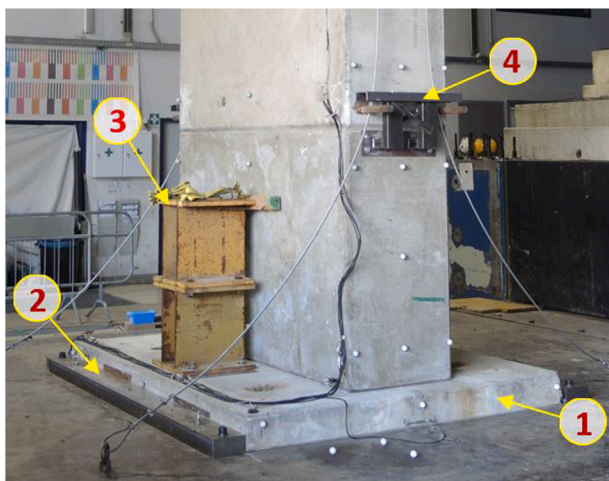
Common details of each specimen: (1) concrete foundation slab, (2) steel profiles to inhibit the translation of the slab, (3) steel stoppers at the base, (4) steel retaining system between concrete blocks along the height of the specimen.
